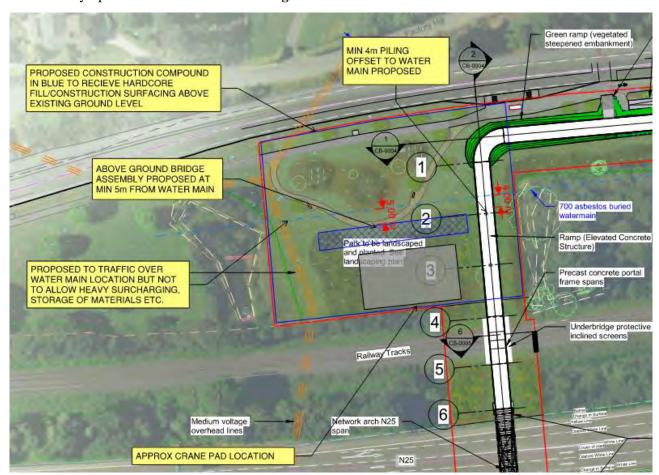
Proposed easement to underground water main running through bridge assembly area
